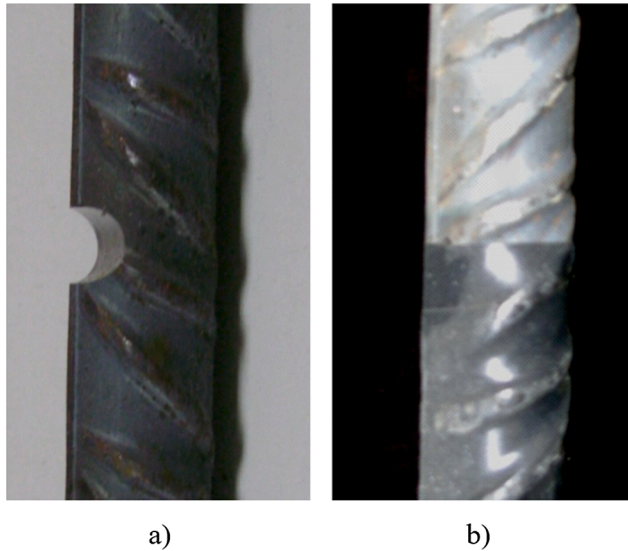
Artificial damage: a) pitting, b) general.
